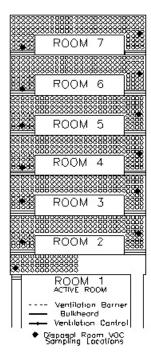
Typical Disposal Room VOC Sampling Locations
